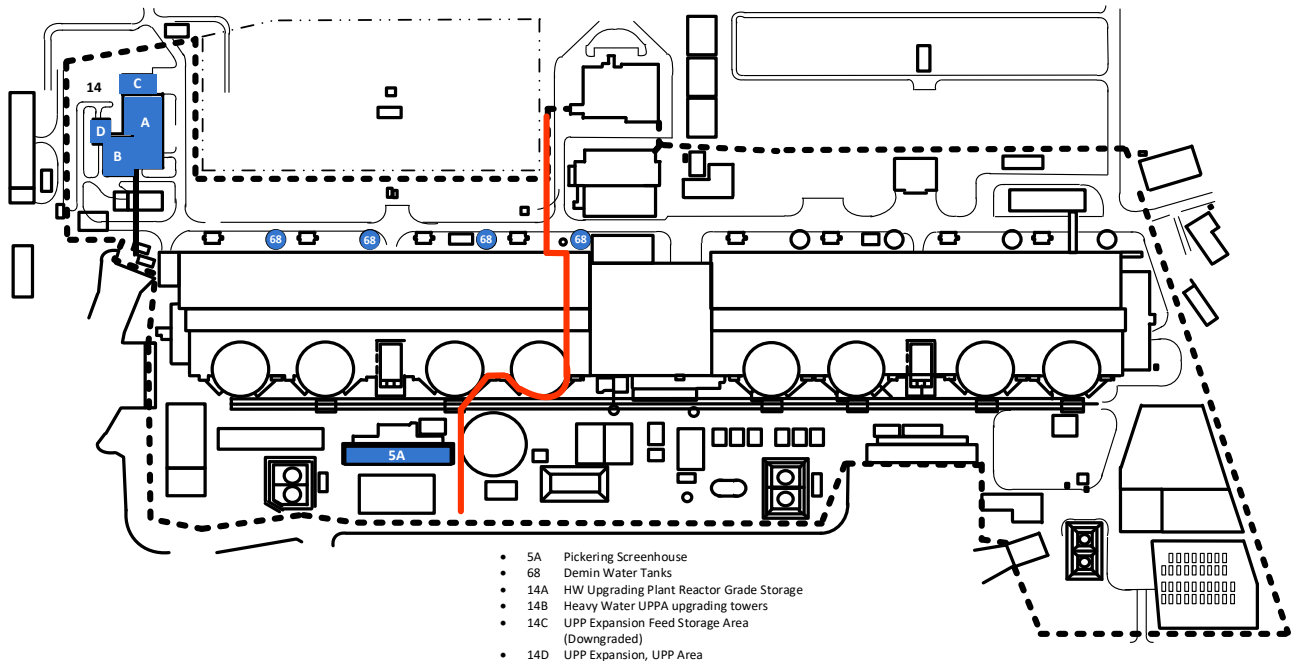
Planning Envelope A - Group A-3 Out Buildings Highlighted in Blue
